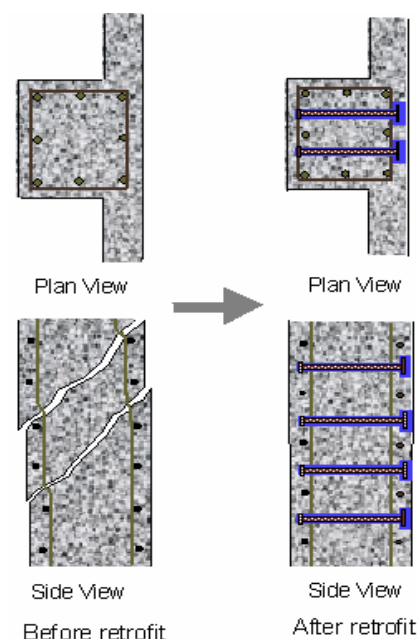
Concept of Retrofit: To Prevent Shear Failure of Column by Adding Shear Reinforcement
